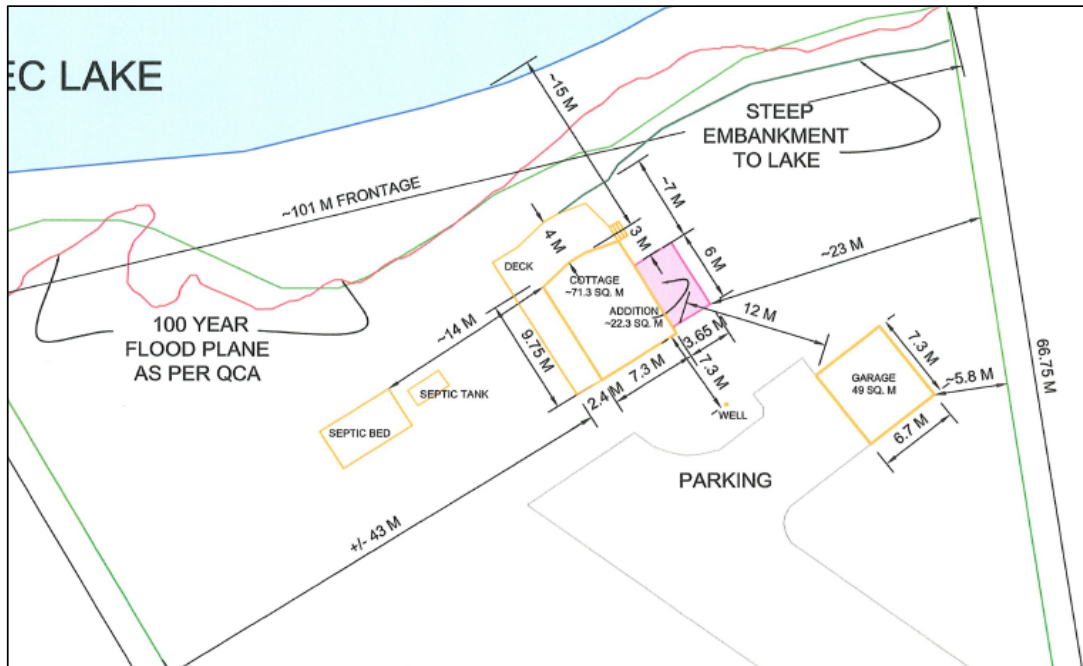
Sketch submitted with the application showing the existing dwelling (yellow outline), and the proposed addition area (pink box).
